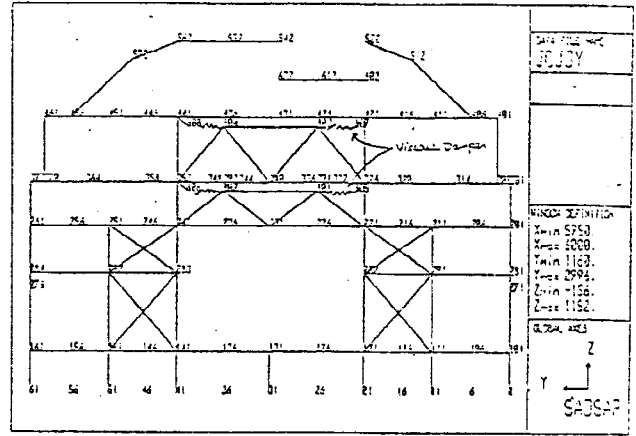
B LONGITUDINAL FRAME DAMPER LOCATION
